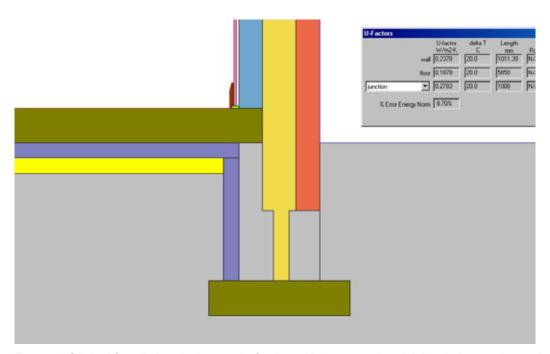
Original foundation design – strip footing with 65mm under-slab insulation, perimeter insulation, thermal blocks between slab and footing and cavity insulation extended below ground level.
